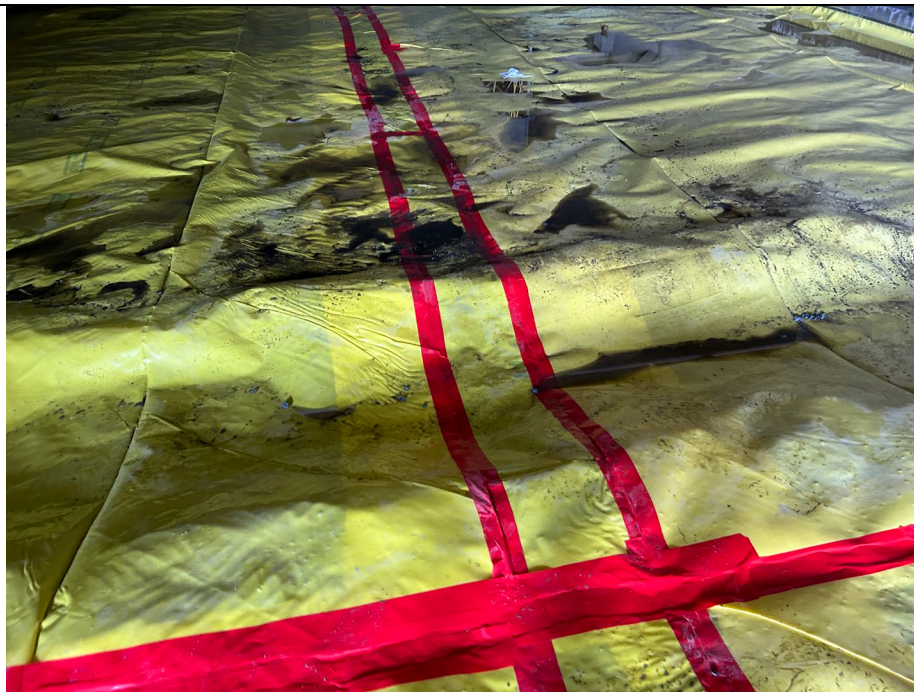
Vapor barrier installation after utilities installation was completed in grid B2.
